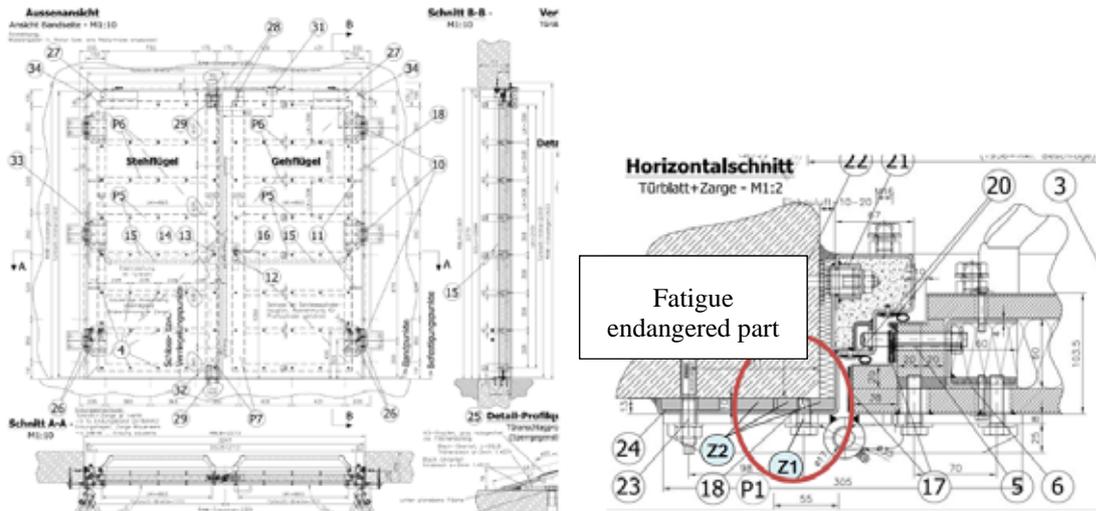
Blue prints of the emergency exit door, Detail of the attachment of the hinges to the door frames. [3]
